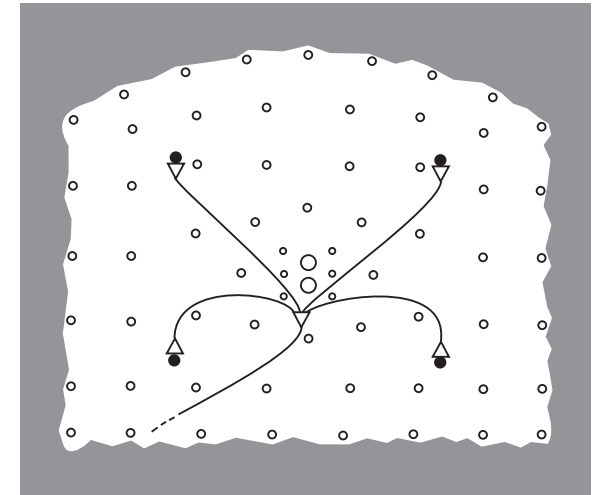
Connection of tunnel round with non-electric bunch connectors.
